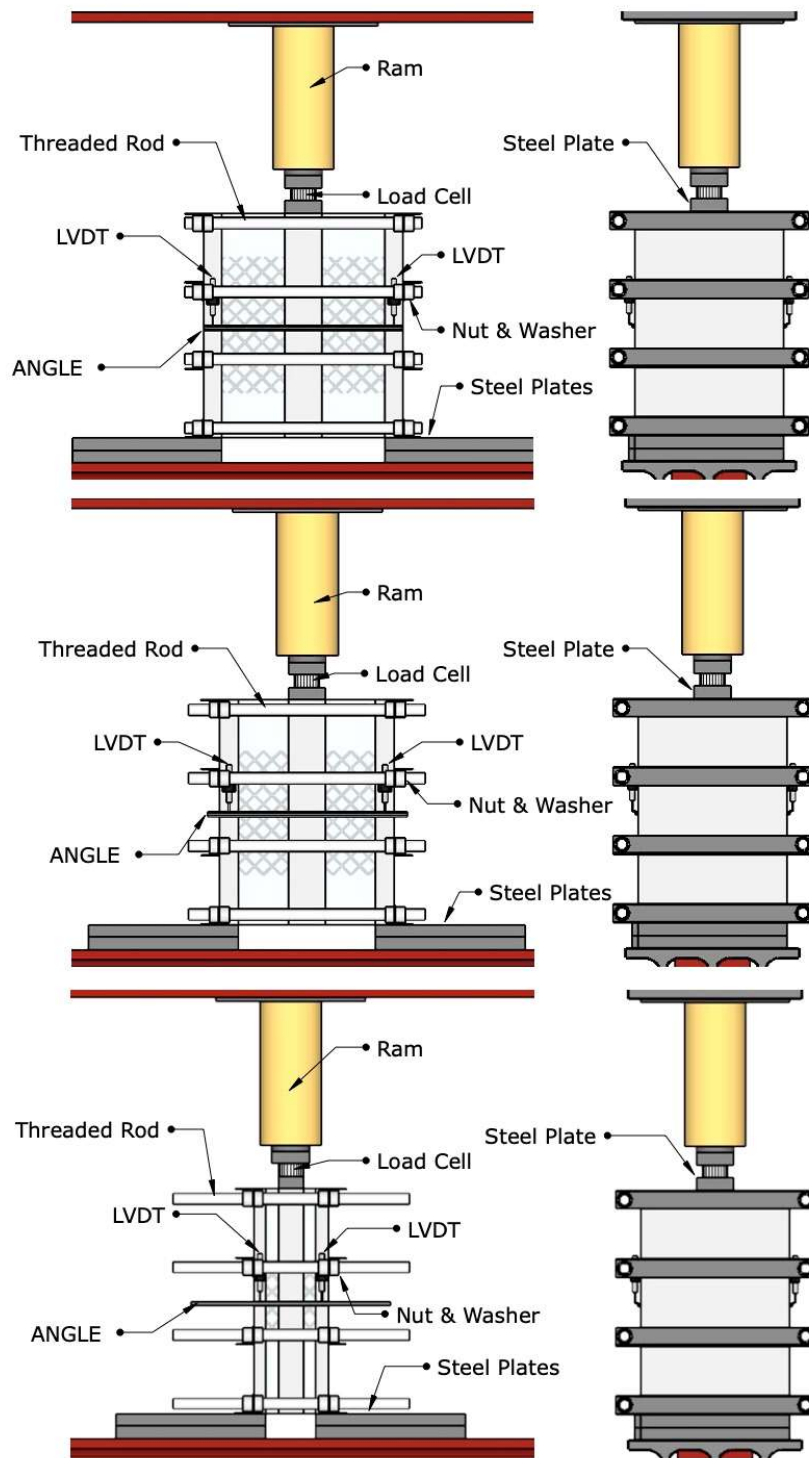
Double Shear Test Setup (F10, F8, F2 Top-Bottom)
